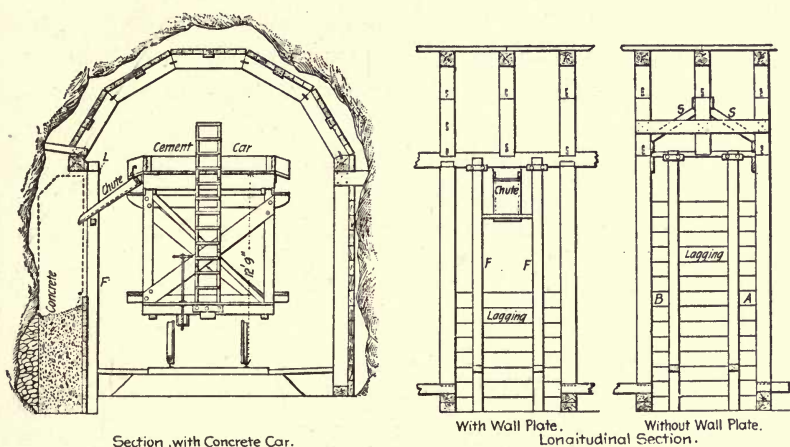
Mullan Tunnel: Cement-mortar Car, and Timbering Used in Relining Tunnel.
